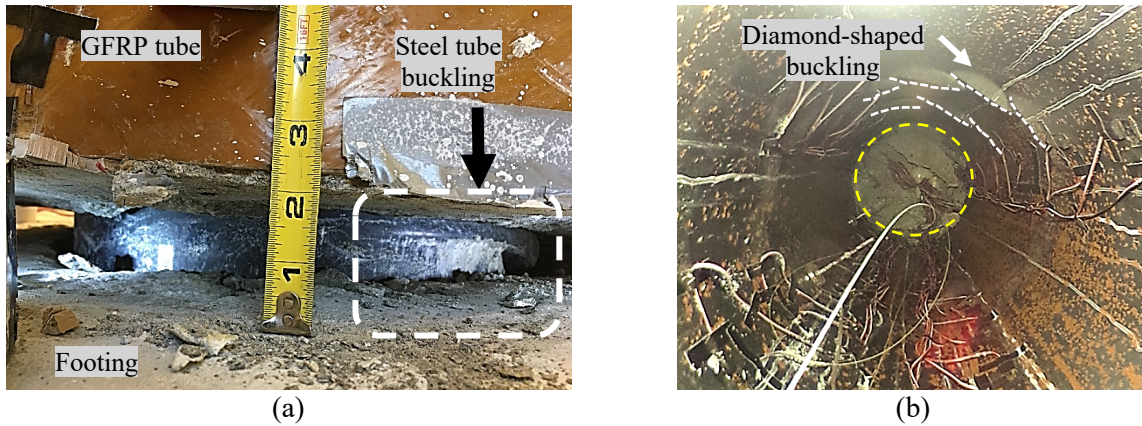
F4-24-E3(0.5)4 column steel tube inward local buckling (a) from outside at 5.8% drift, and (b) from inside (north-west side) at 7.5% drift
